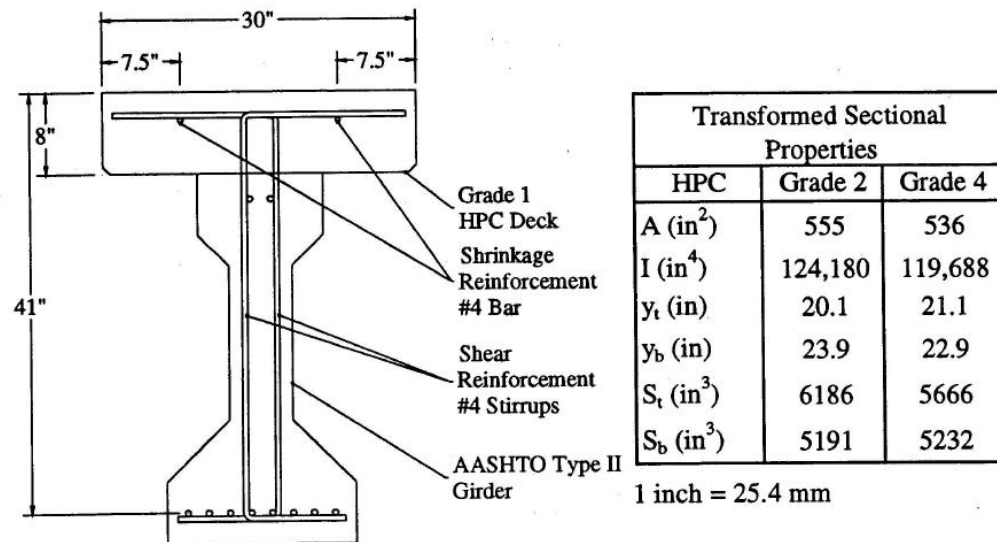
Typical Cross section and transformed sectional properties for Type II girders (Dill and Kahn, 2000)
